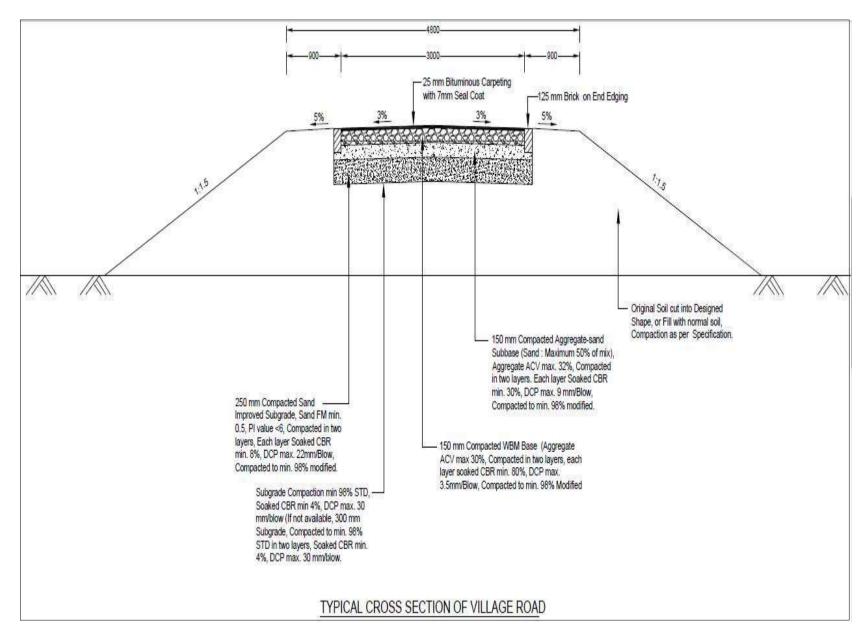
Typical Cross Section of Village Road (LGED, 2005)
